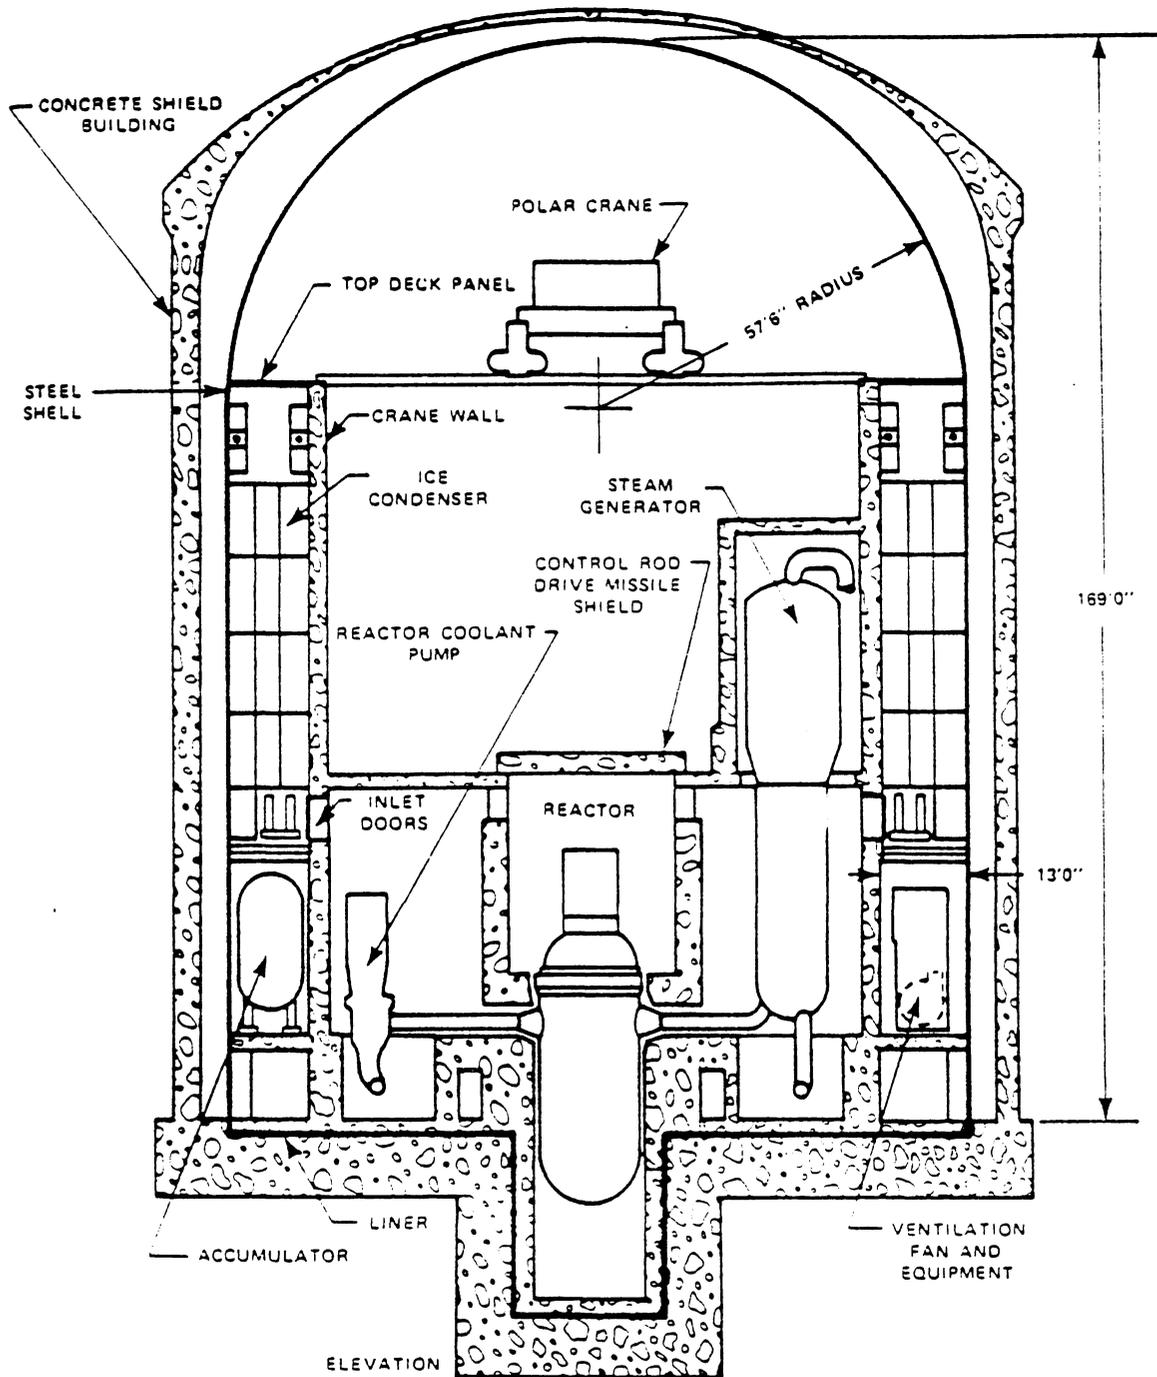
CROSS-SECTION OF A PWR CONTAINMENT BUILDING.
